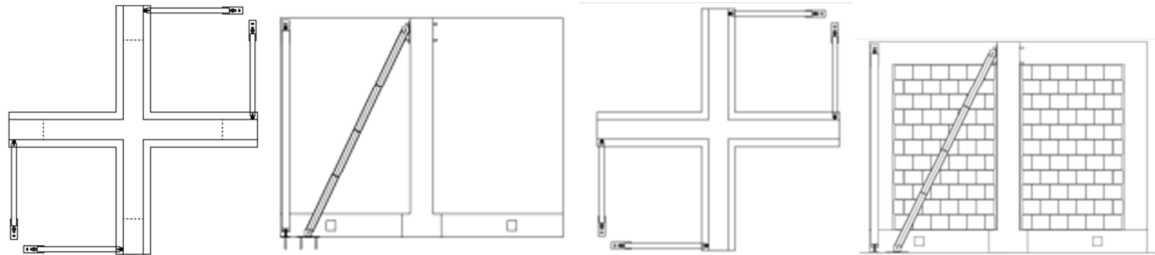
Design views of structural unit layouts under testing, see Annex A for a quoted drawing
